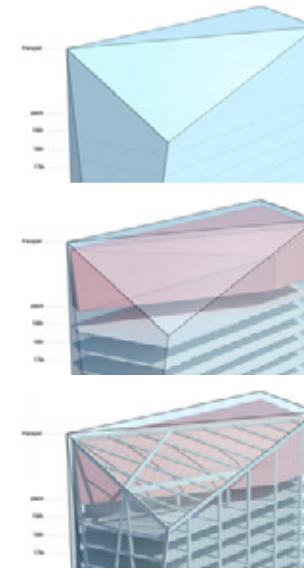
AHMM's diagrammatic drawings for the 19<sup>th</sup> floor: sky-room, plant and building envelope
